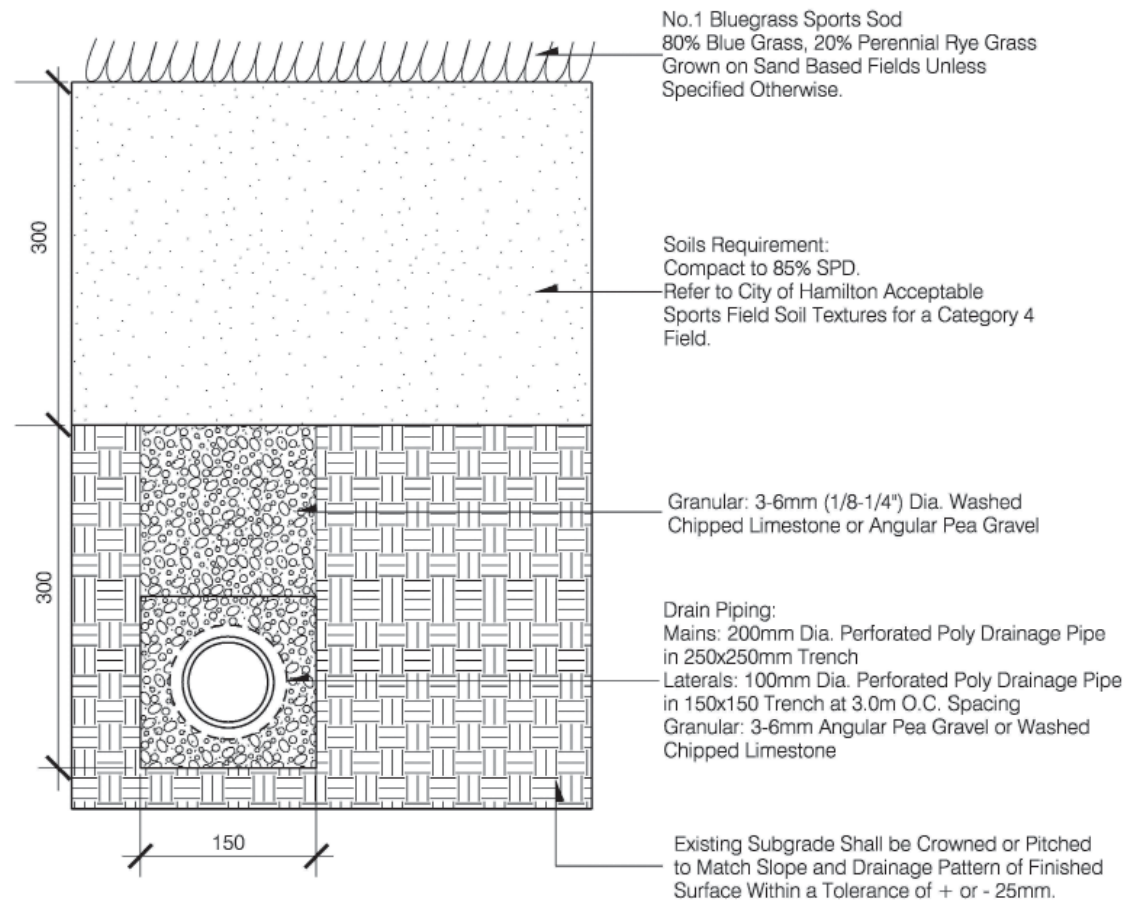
A cross-section detail of a perforated pipe system. (Source: Aquafor Beech)
